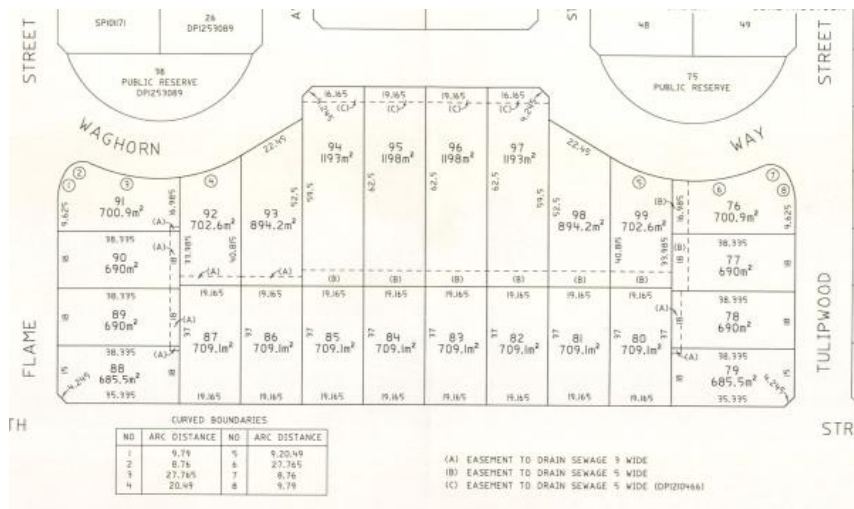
shows proposed amended lot layout for Stage 4 of the subdivision.
